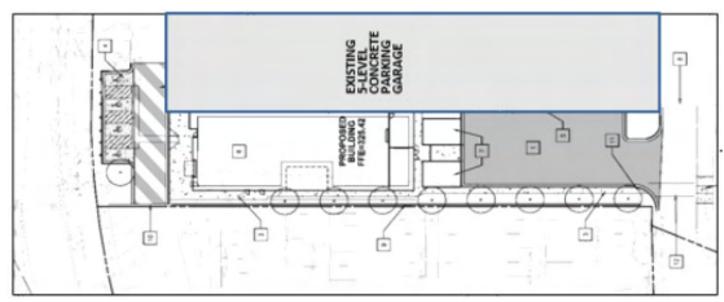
Proposed Site Plan-PLD Maintenance Facility
